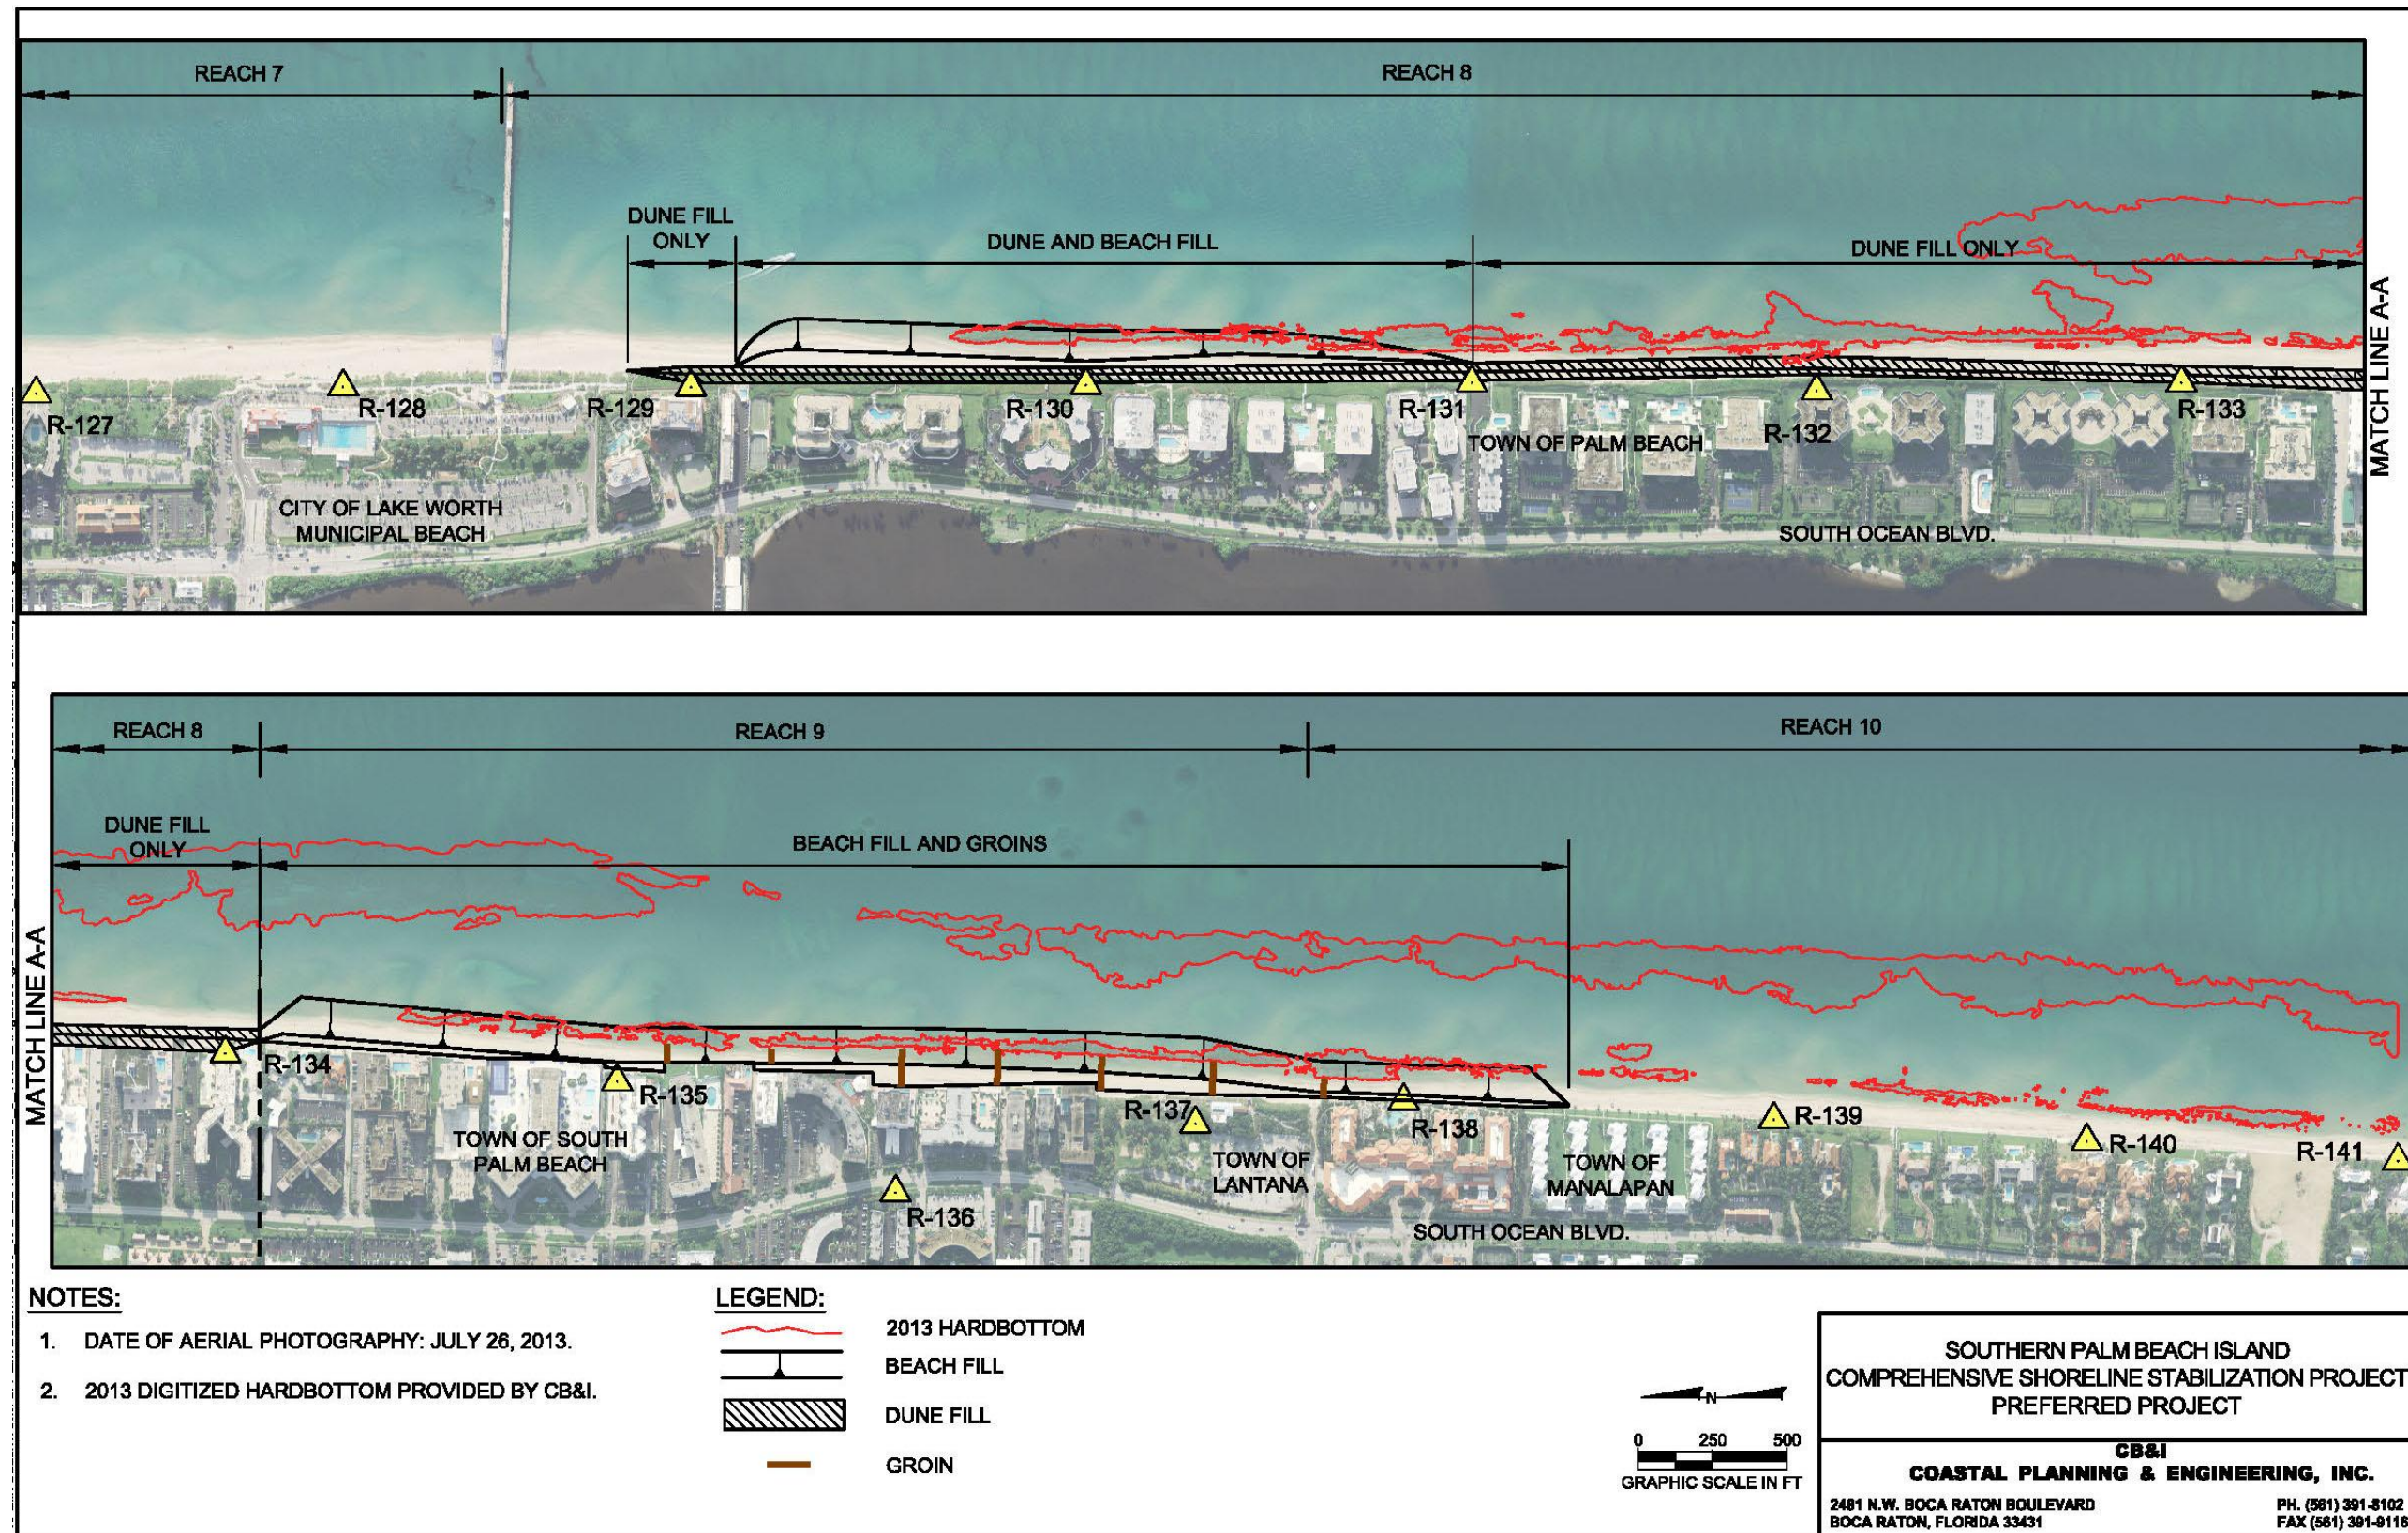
Proposed Southern Palm Beach Island Comprehensive Shoreline Stabilization Project (Alternative 2 – Applicants’ Preferred Alternative).
